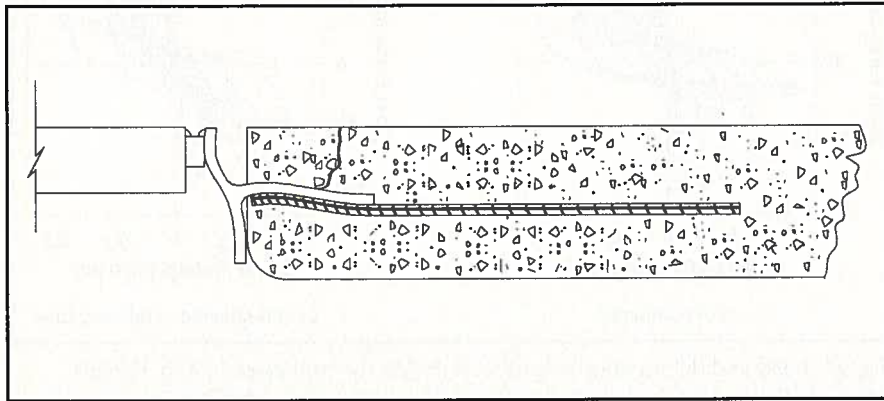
Prying action in panels with a structural tee connector due to eccentricity between the slug weld and the reinforcing bars.
